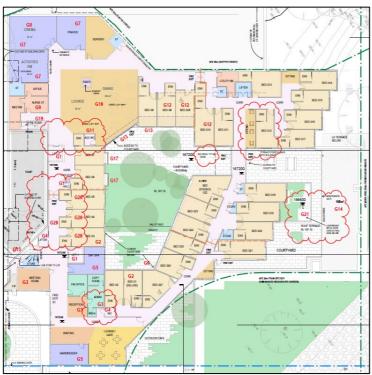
Stamped Plans – Ground Floor Source: Morrison Design Partnership Pty Ltd
